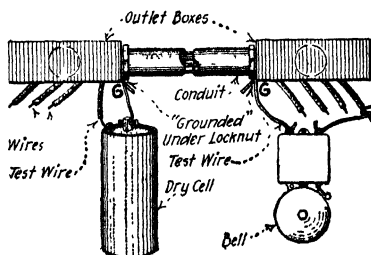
Testing out using a conduit-return test circuit. Test wires are “grounded” (connected to the conduit) at G and G.
